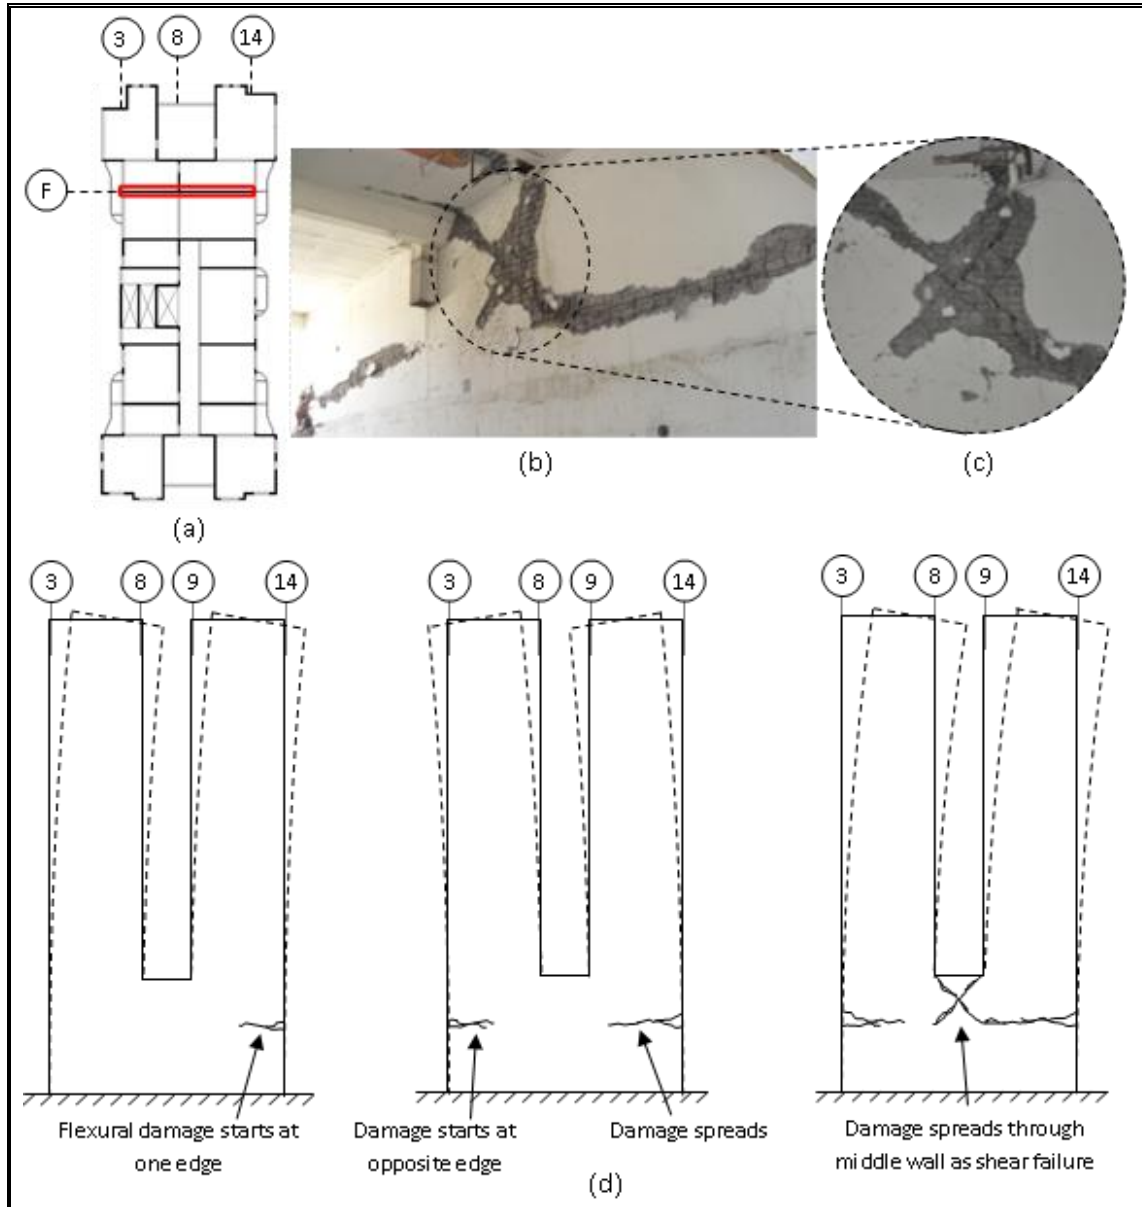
(a) Location of walls in plan CM-3, (b) observed damage, (c) shear failure at central wall and (d) induced damage in elevation F.
